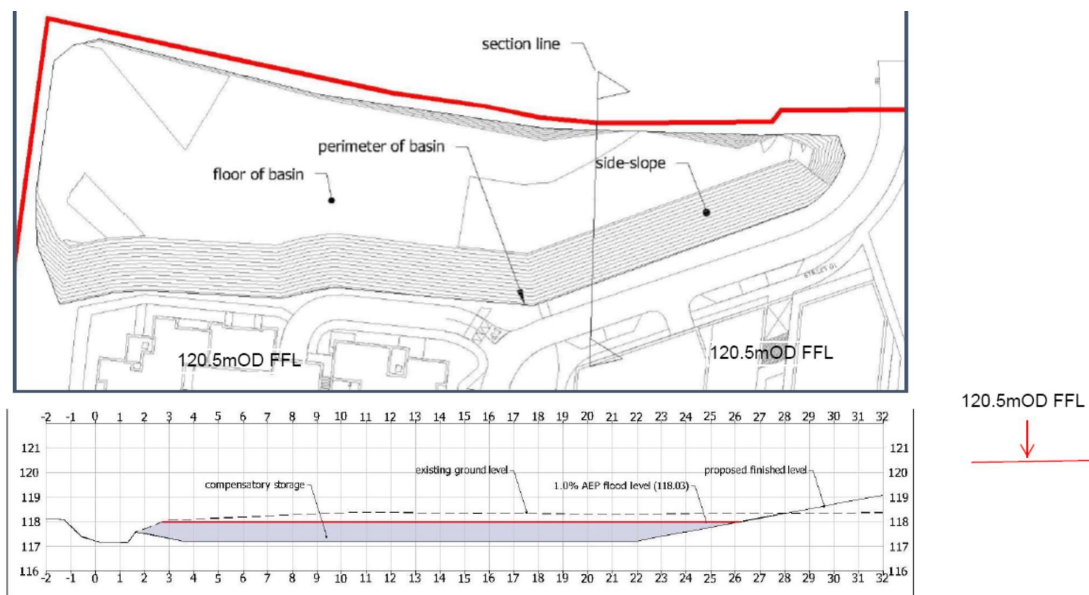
Extract from SSFRA fig.5.2 Plan and Typical Section for Compensatory Basin
